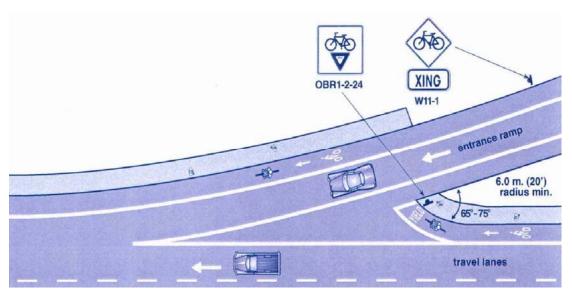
Signage and pavement markings encouraging bicyclists to cross ramp
